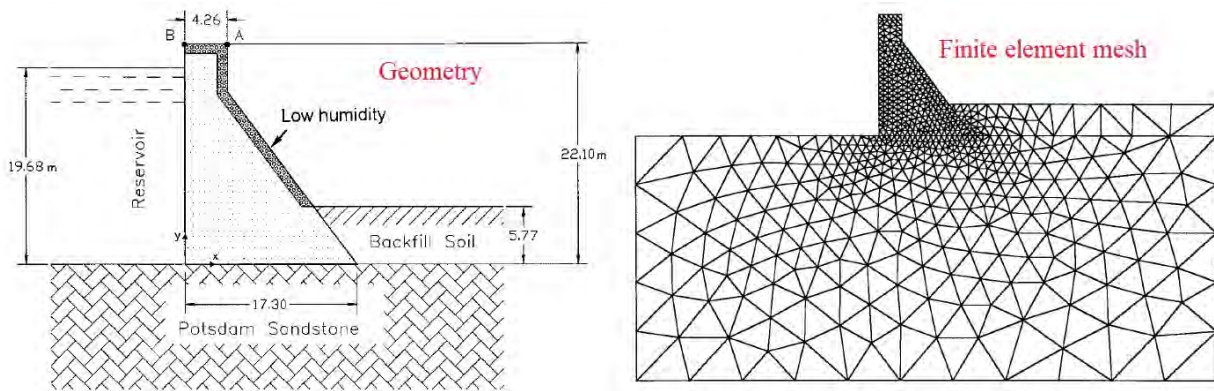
Geometry and finite element mesh of dam-foundation system; Huang and Pietruszczak (1999)
